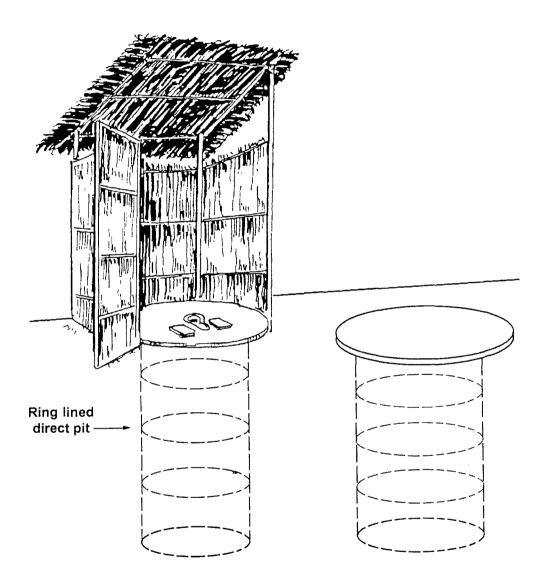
Twin pit direct latrine with a concrete ring pit lining system
